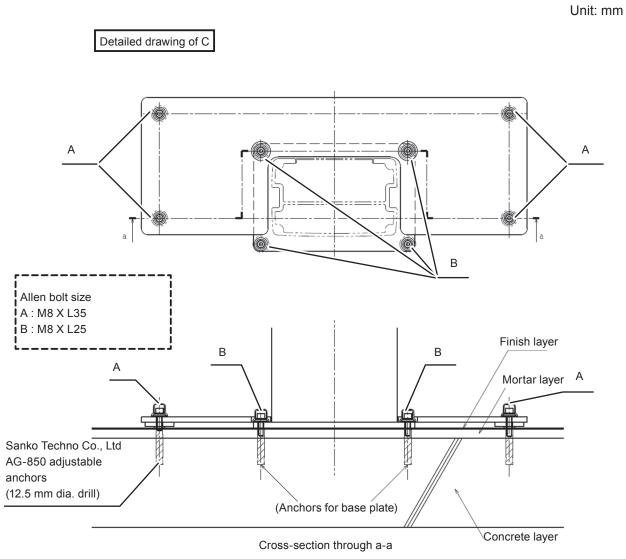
Floor fixing detail drawing (Cephalometric type)
